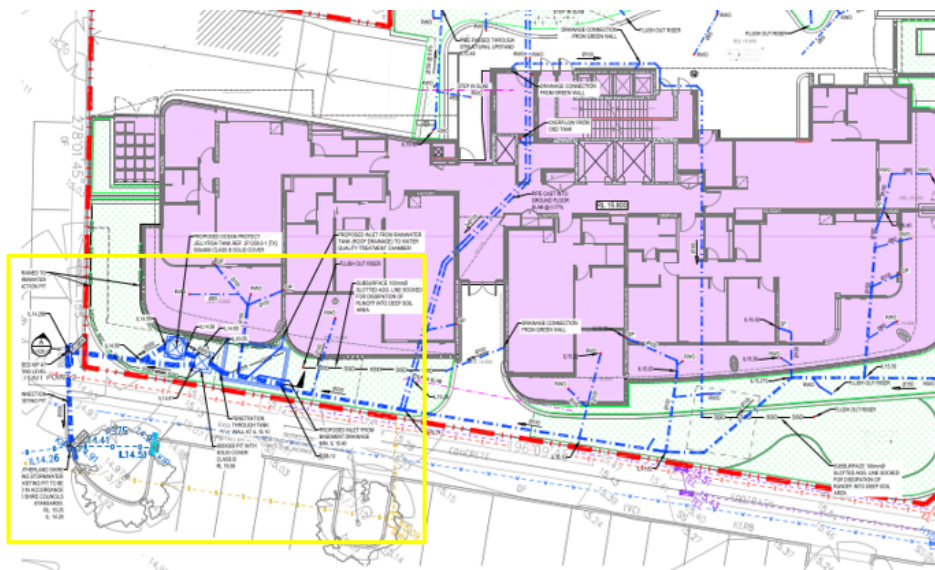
Proposed civil plan showing the OSD, the new Jellyfish tank and drainage pipe detail.
